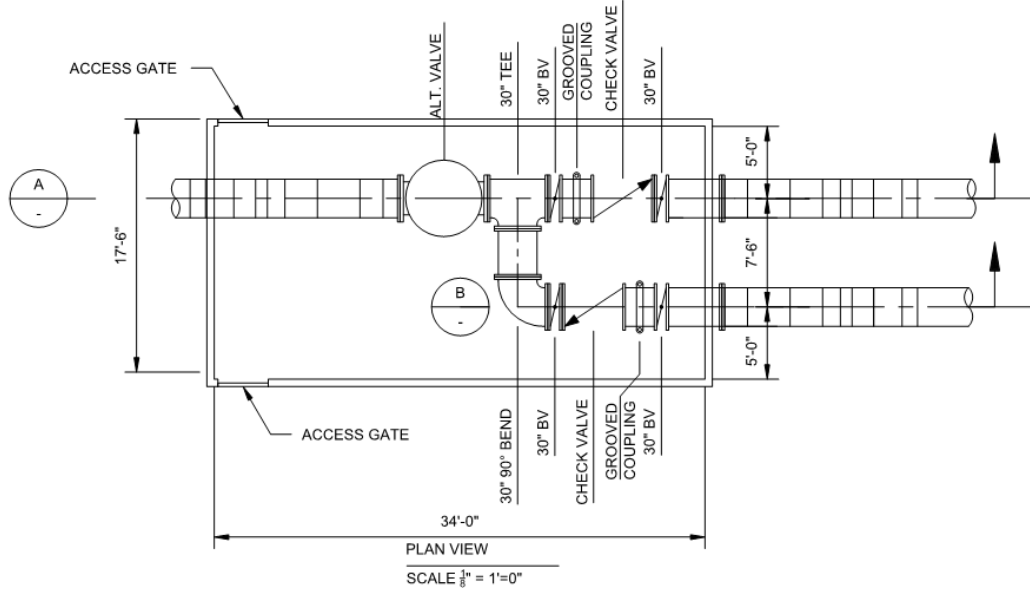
Inlet/Outlet Piping Valve Enclosure (Plan)
